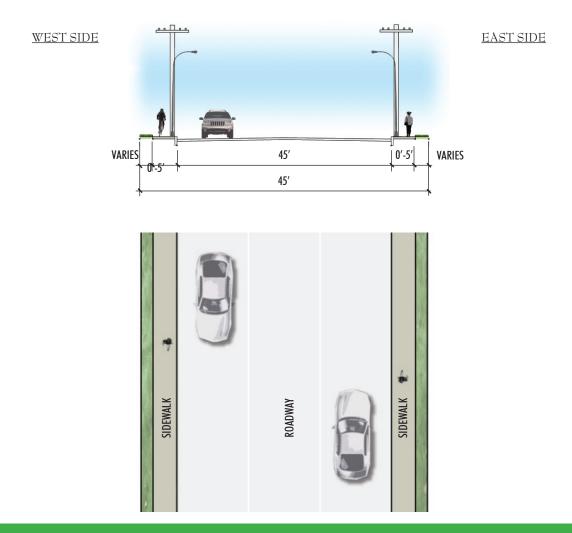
The Hub: Zone 8 Existing Conditions Section and Plan
